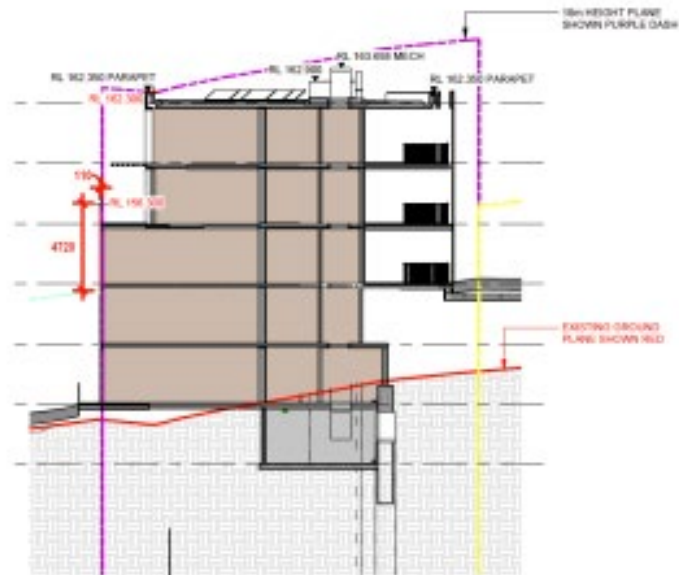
Cross section 2 – Building B (Cox drawing DA-99-06)
